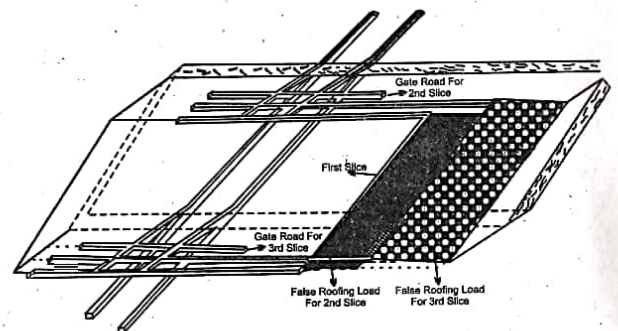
Developing for Inclined slicing. False roofing may be laid for 2nd and 3rd slice separately
